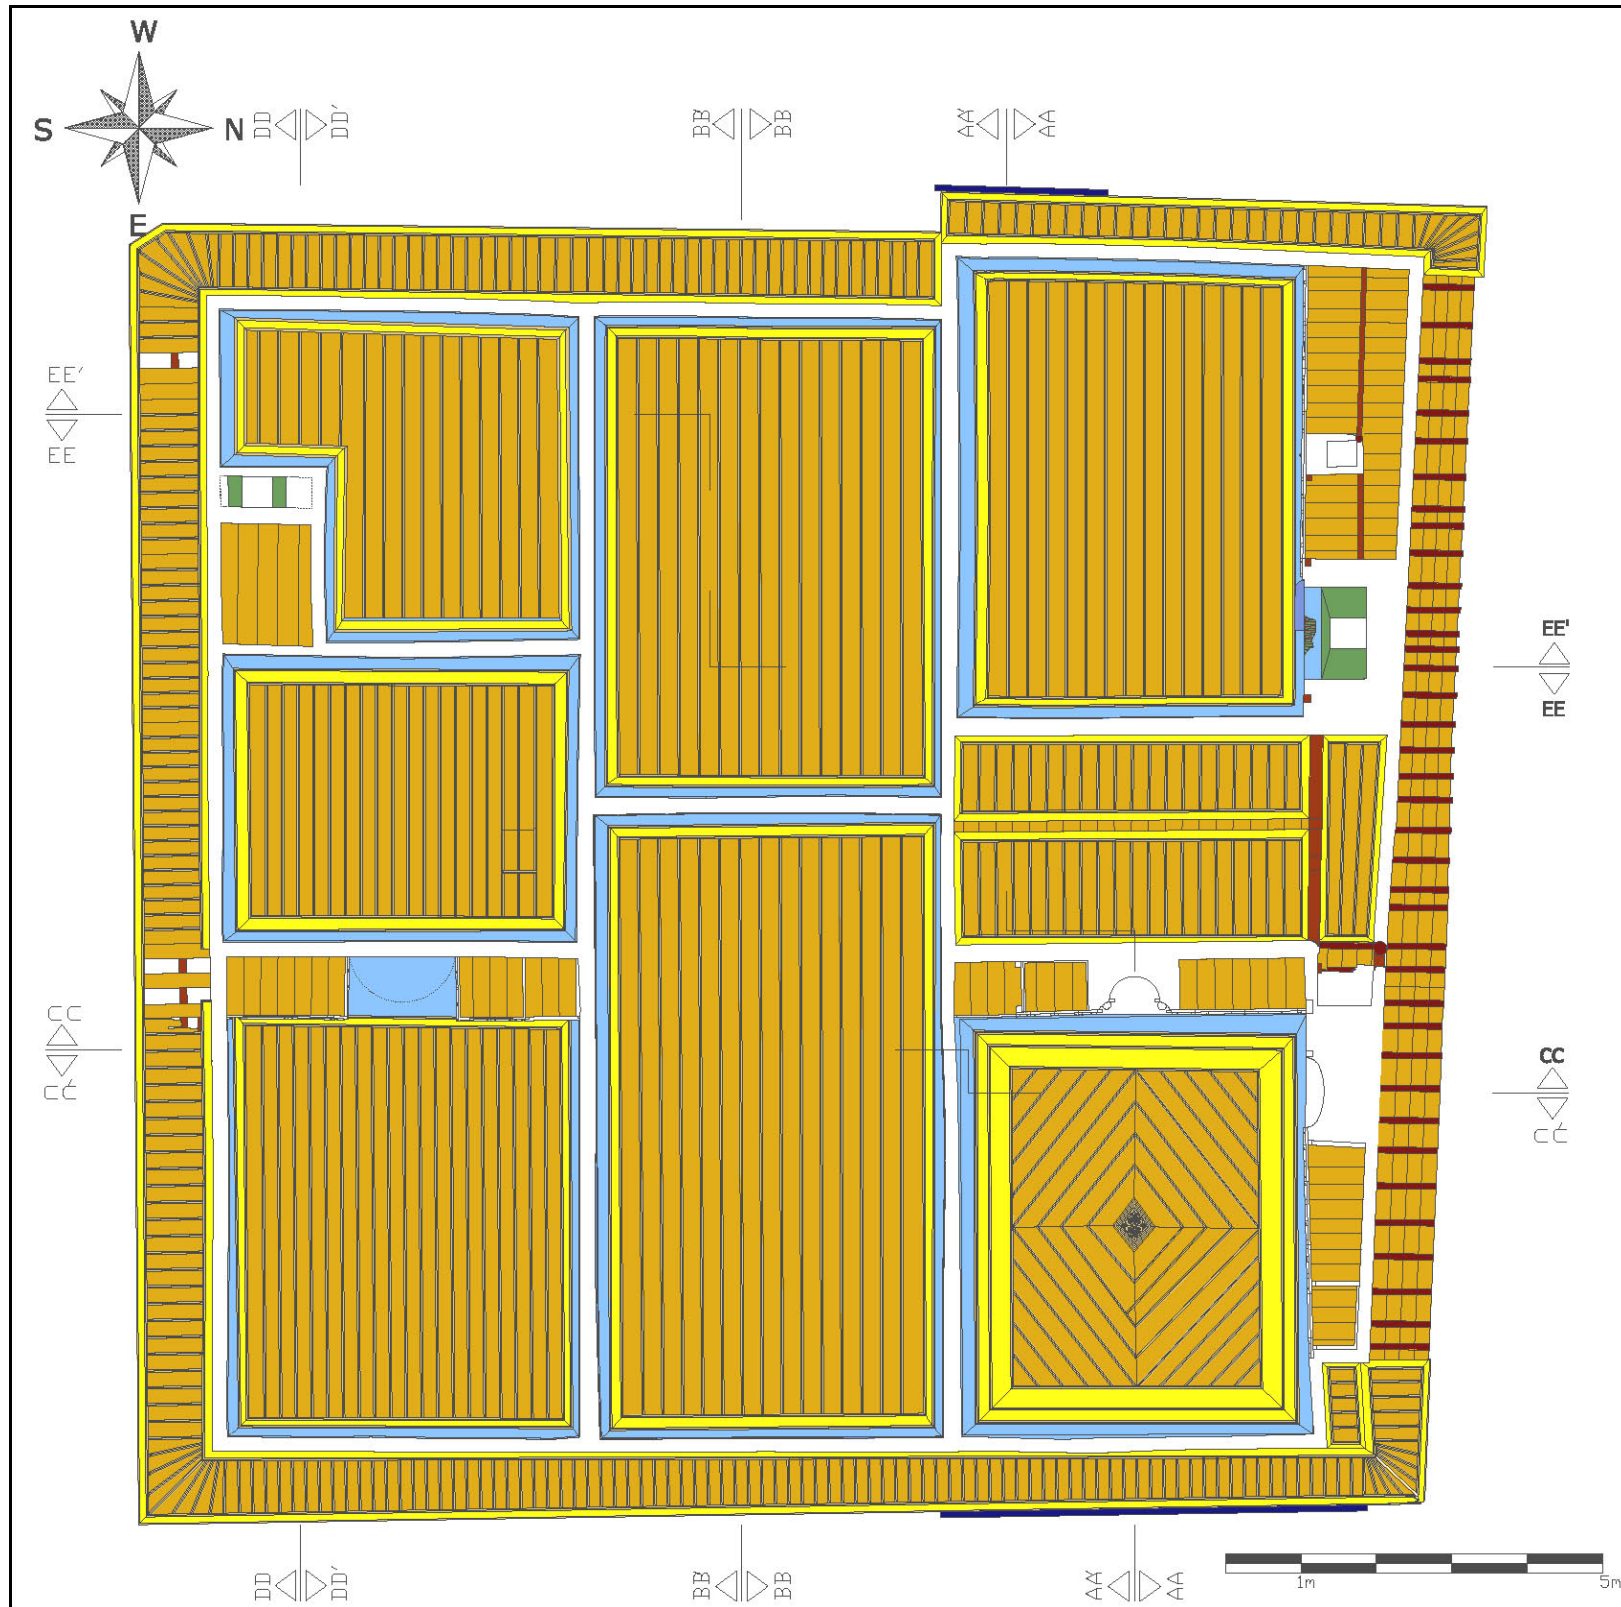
Analysis of Material-First Floor Reflected Ceiling Plan; Scale: 1/100 (Presented in 1/50 at Jury)
